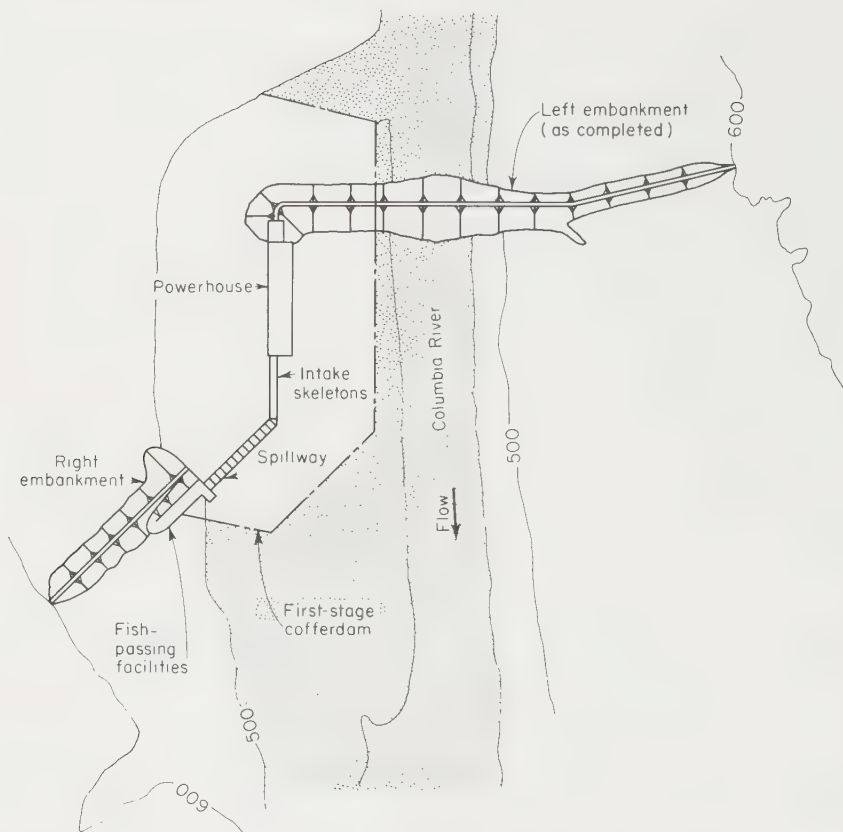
Wanapum Dam project (Washington)—river diversion.
